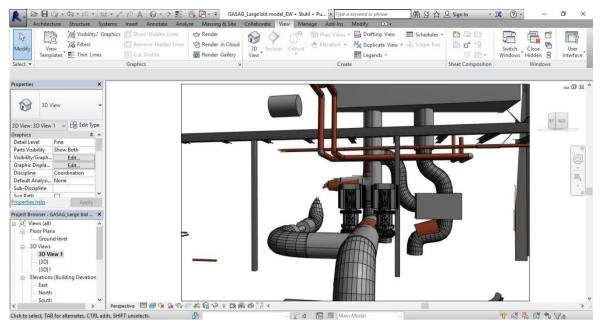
Test Building Revit Model of Pump (Source - HTW Berlin.)
